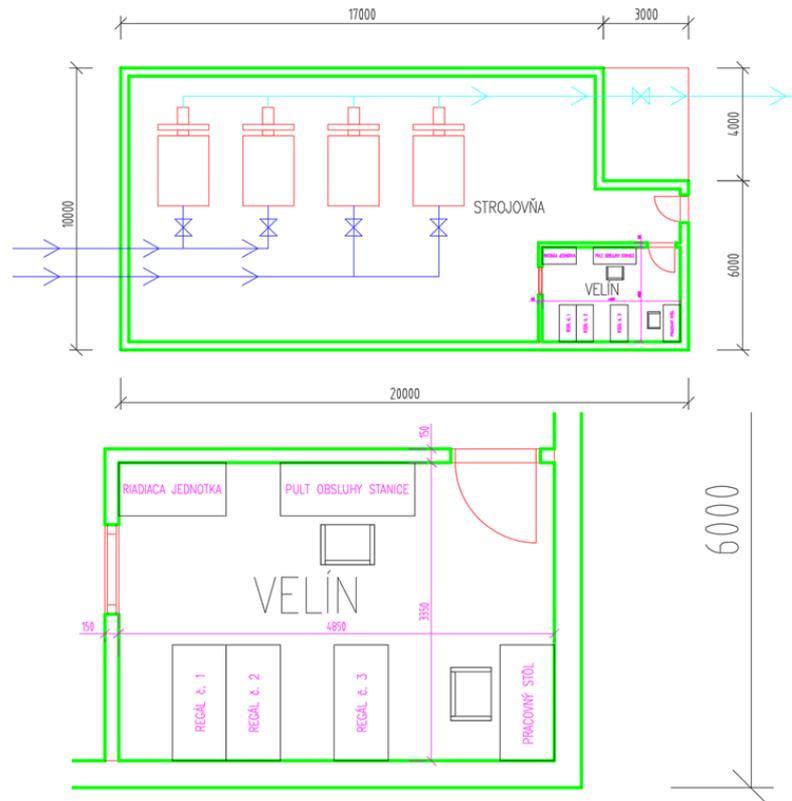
Overall floor plan of the pumping station (at the top) and detailed floor plan of the control centre (at the bottom)
